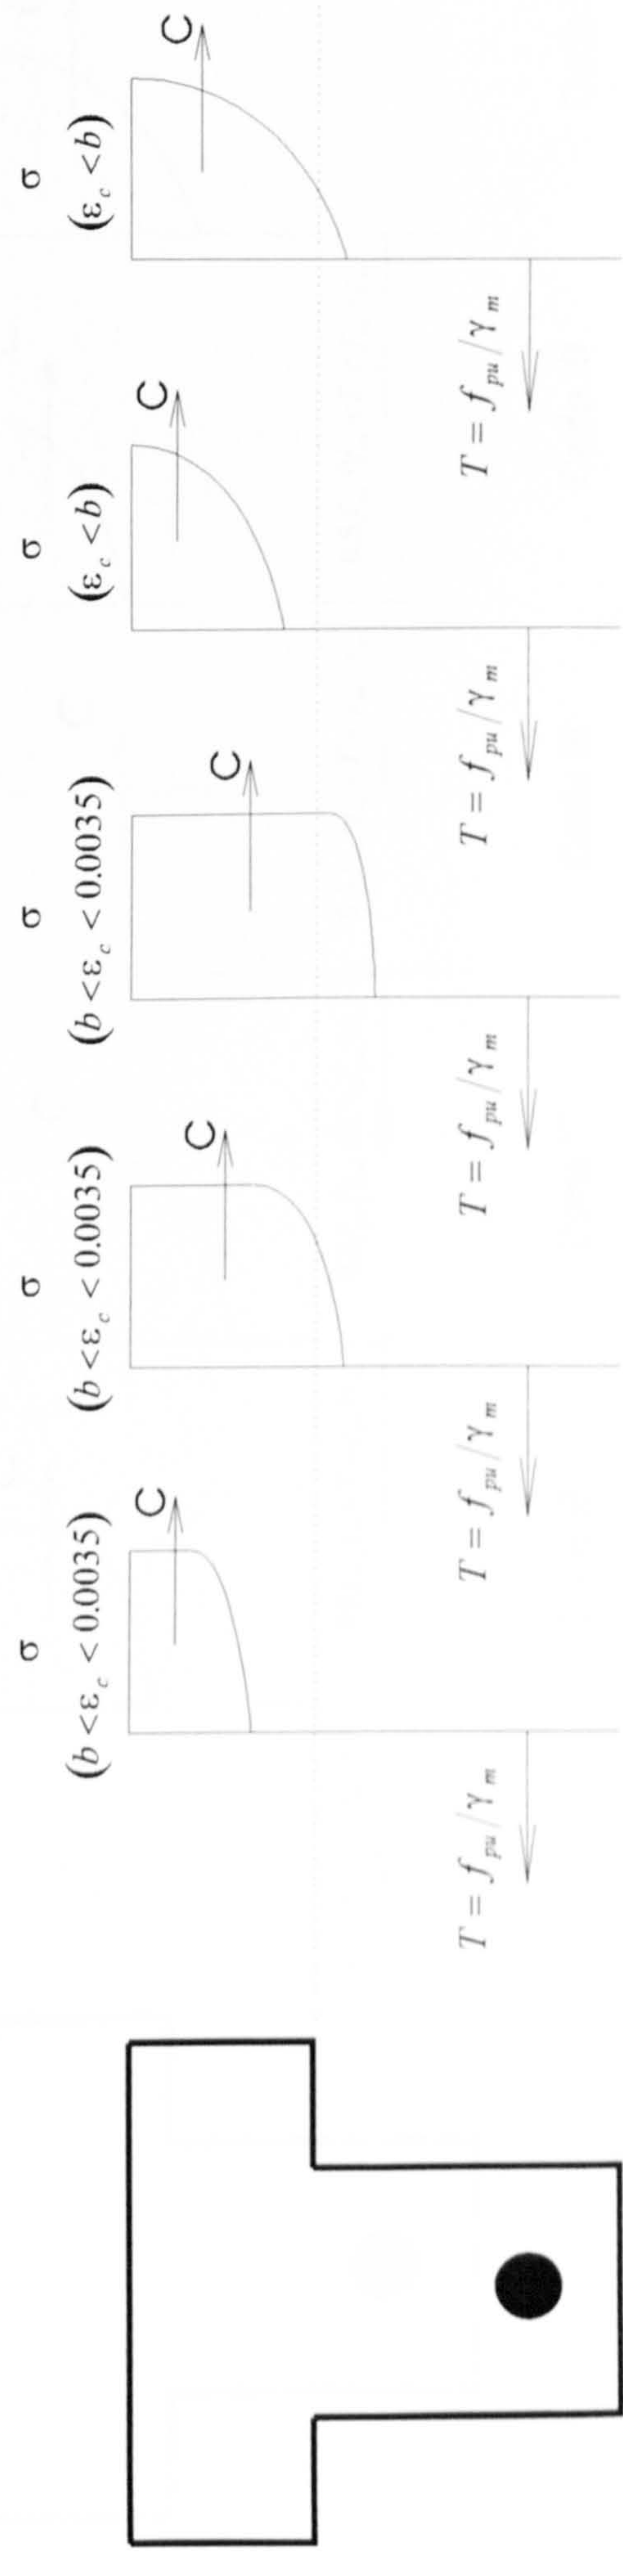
Failure Modes of prestressed Concrete I and T Sections
